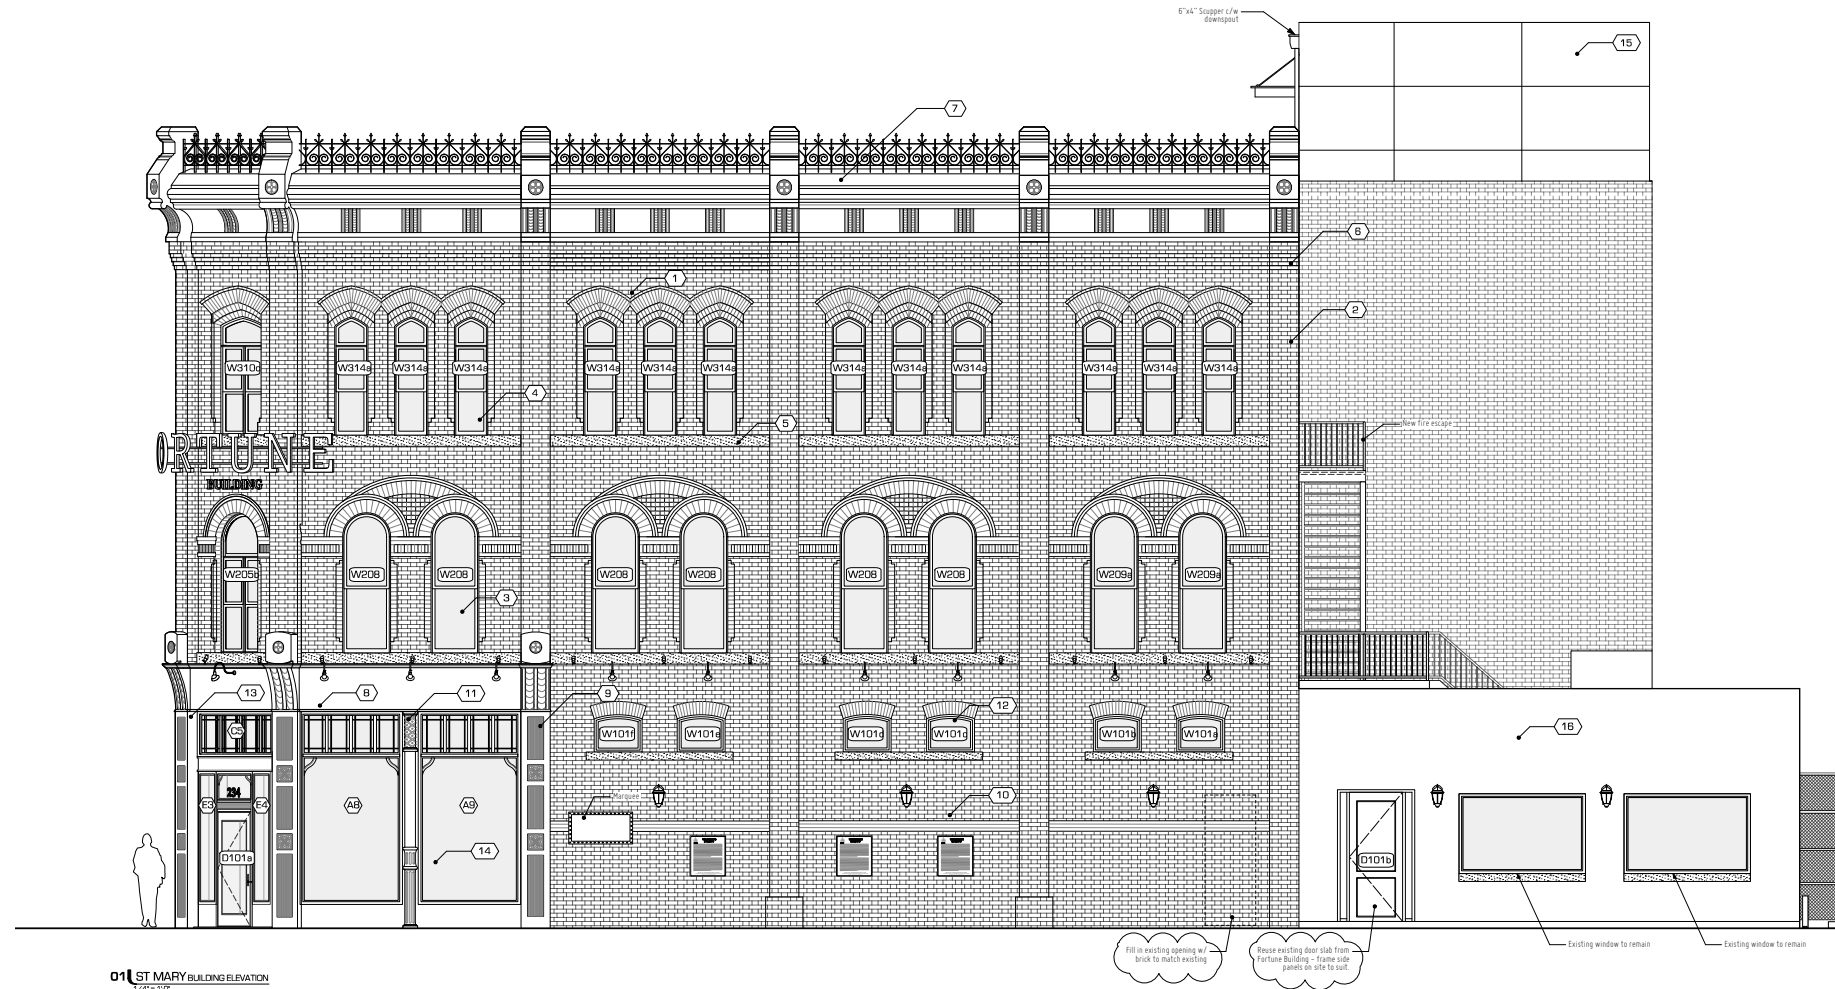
St Mary's Avenue Building Elevation(The Fortune Building, 2021).
